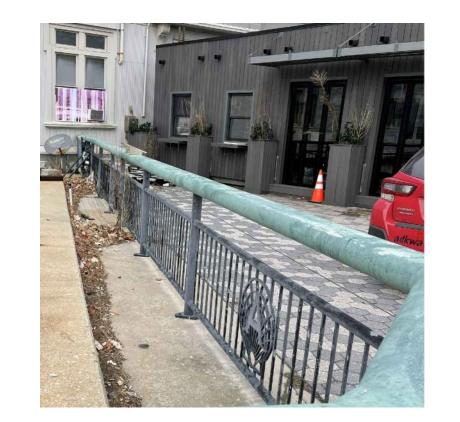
SOUTH BULKHEAD HANDRAILS
